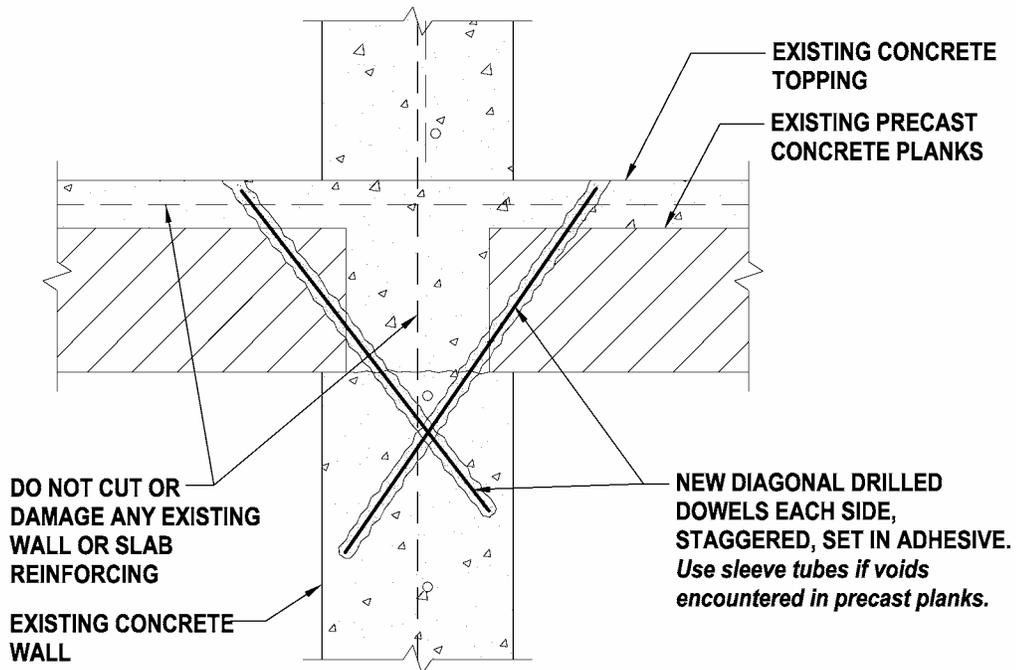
Added Shear Capacity at Slab-Wall Joint
